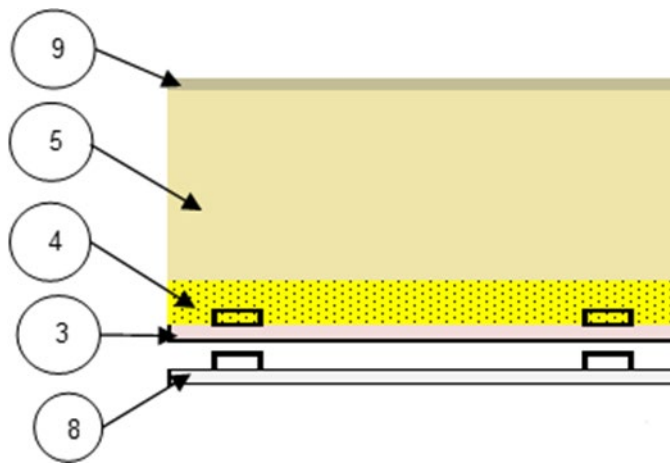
Massive timber framed floor ceiling system with fire grade lining fixed to furring channels that are suspended or clip fixed to massive timber and including optional suspended decorative ceiling – Section view
